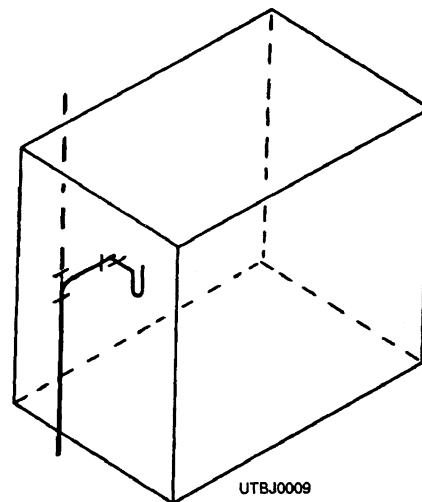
Isometric drawing of a room and drainage pipe.
